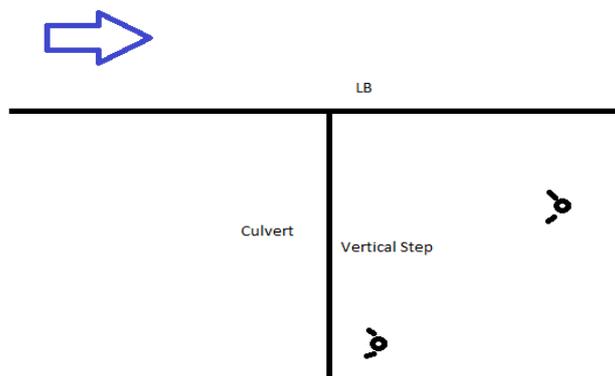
Site plan for Roxbourne Park Culvert 2
